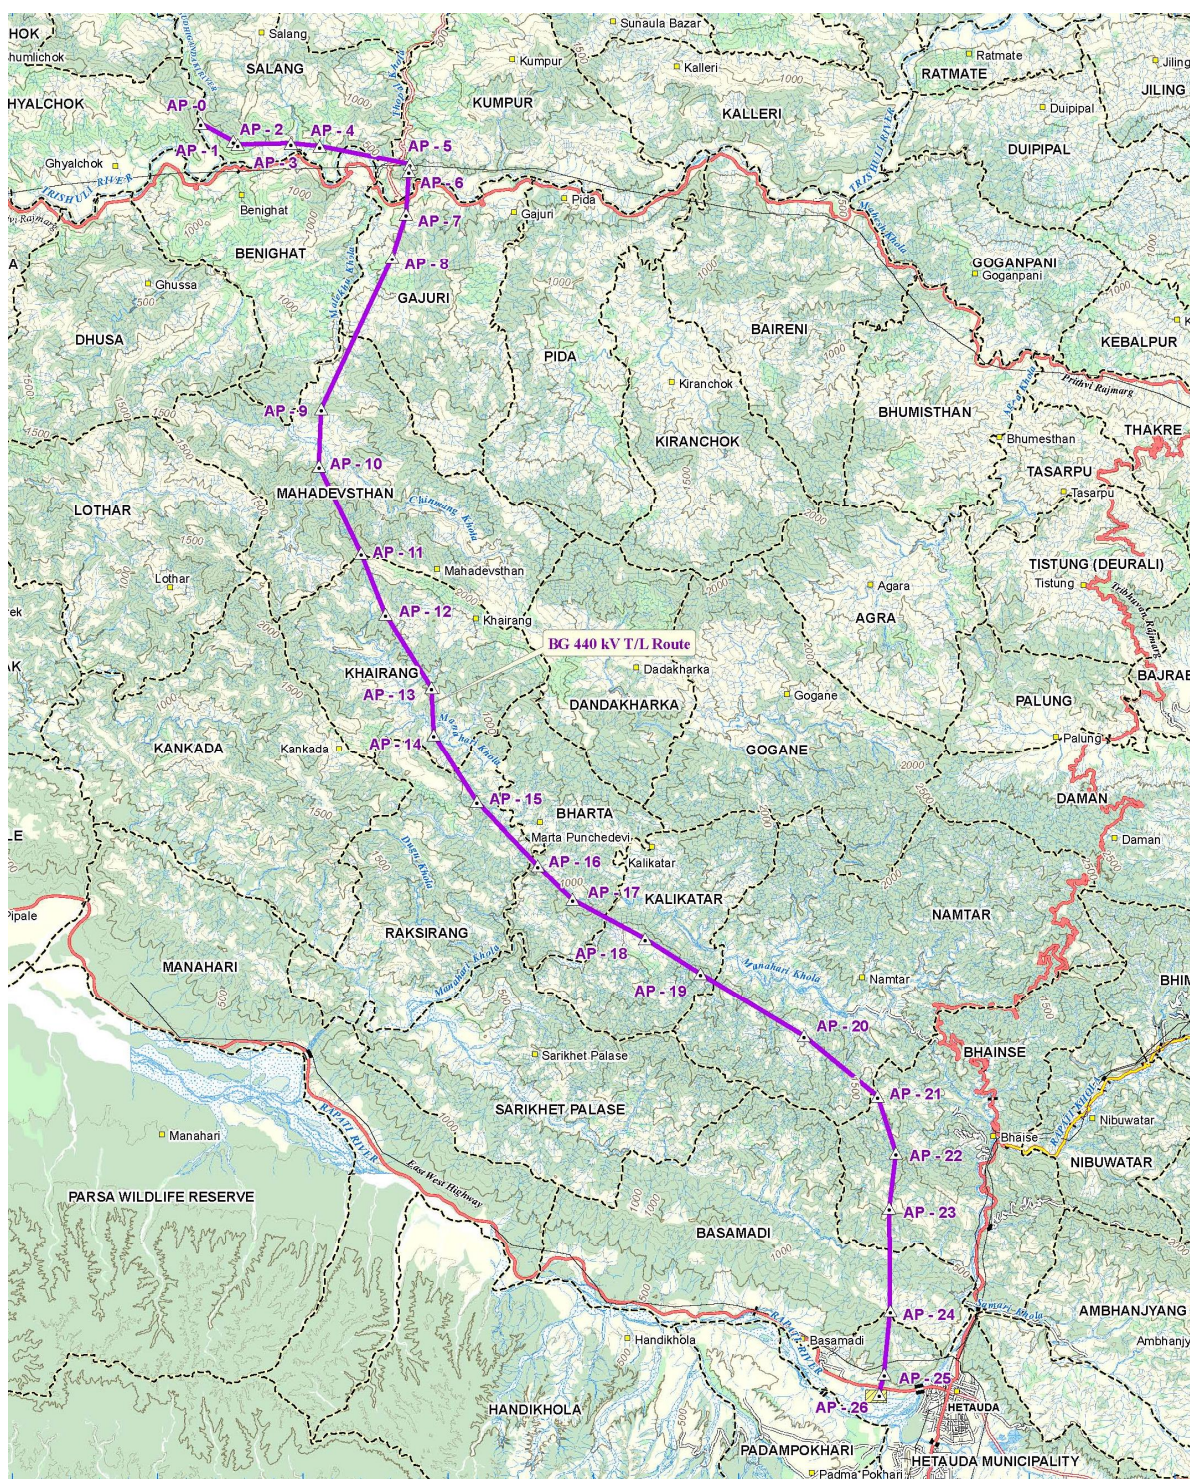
TL 400kV BG HPP – Hetauda substation - General layout plan
